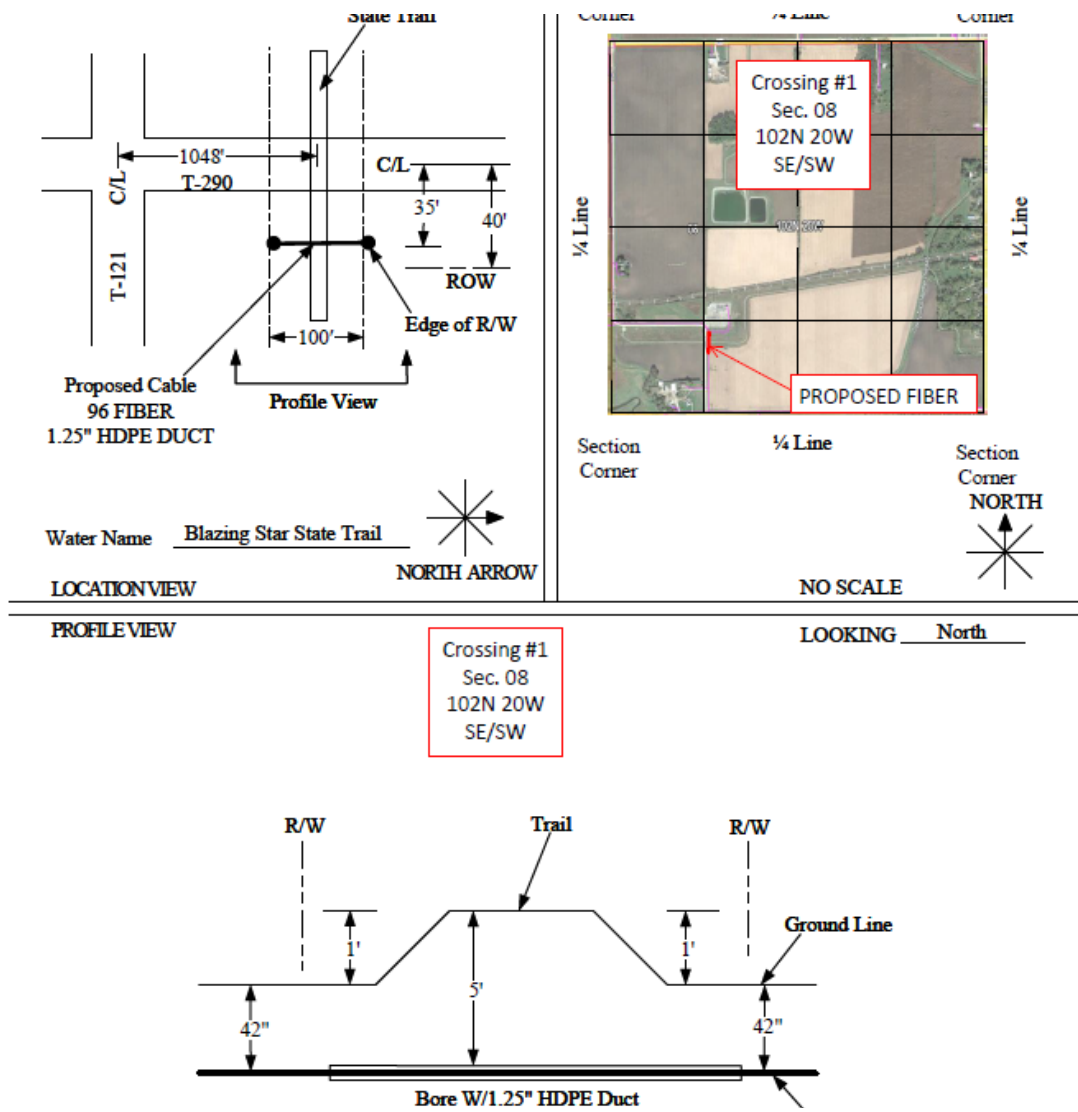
Example 1 of Aerial Map, Plans and Cross-section on one page – Boring under land
